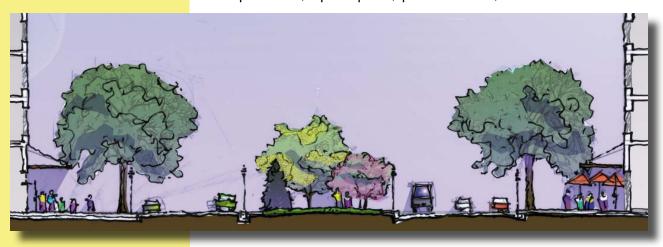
Section through the proposed Beauregard 'Avenue' thoroughfare
